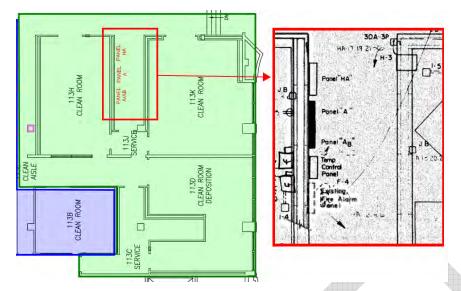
1987 RENOVATION AREA PANELBOARDS
